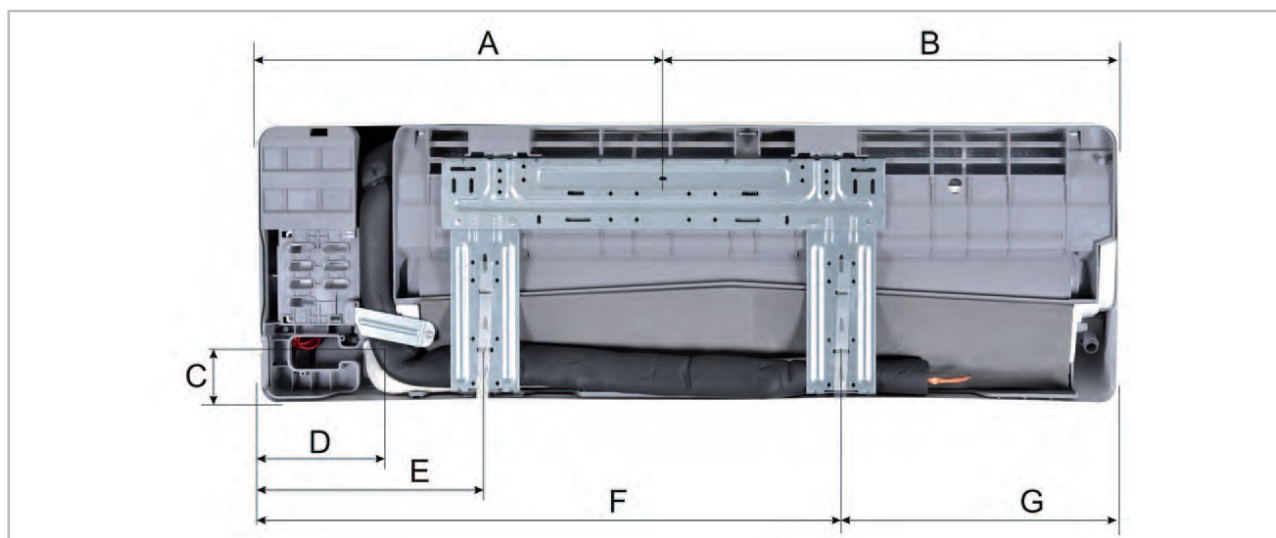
Mounting points for the wall bracket MVW 362-562 (all dimensions in mm)
